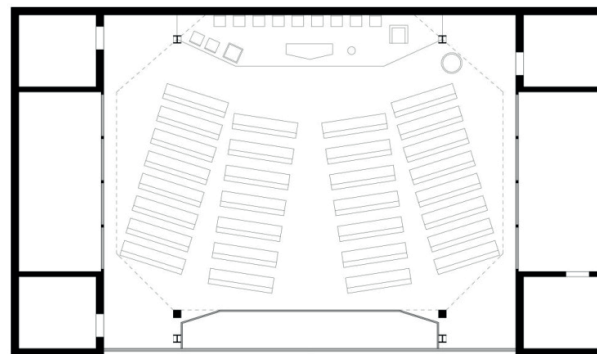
Érdliget: floor plan of the Church of the Assumption (1978-83).
